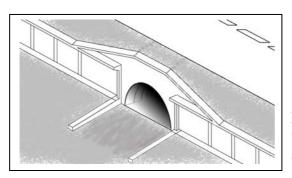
A tunnel underpass with lipped concrete wall for amphibians and reptiles.
